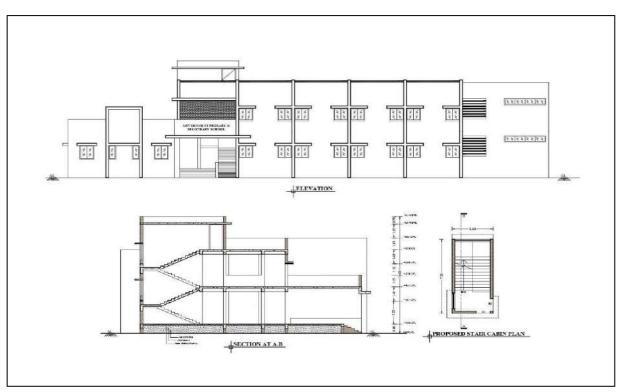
Elevation & Section of Primary & Secondary School
